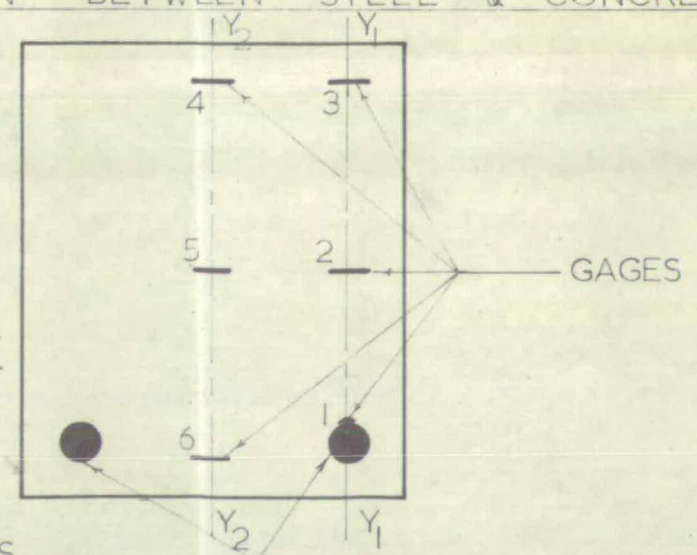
INTERNAL STRAINS ——— REINFORCED CONCRETE BEAM NO.2 ——— F
